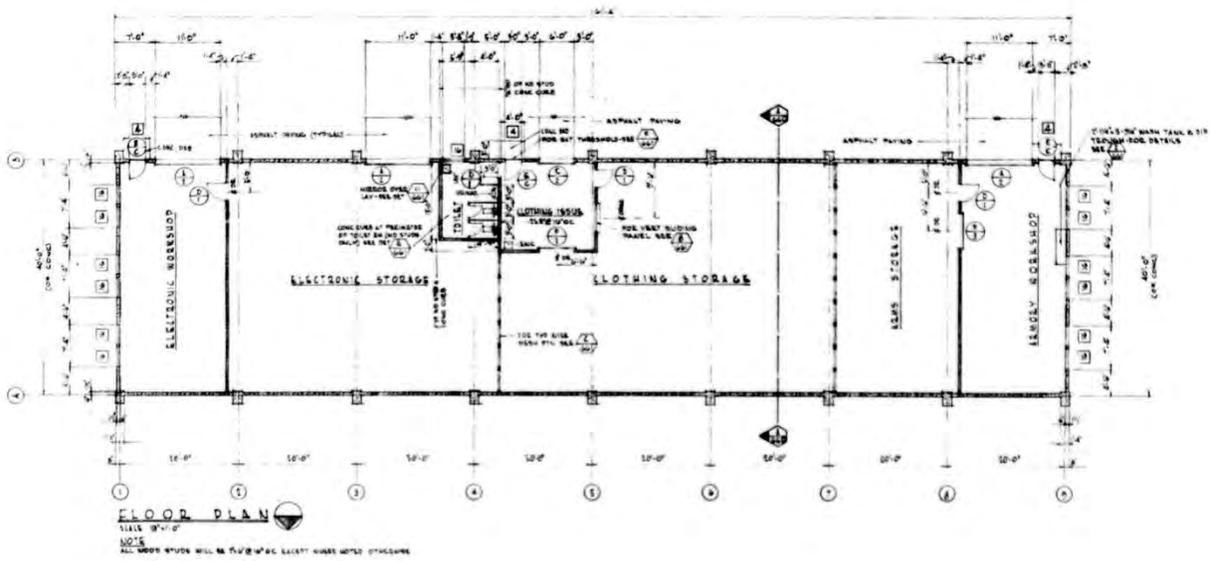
As Built plan view of NTTU dehumidified warehouse, Feature 11a.
